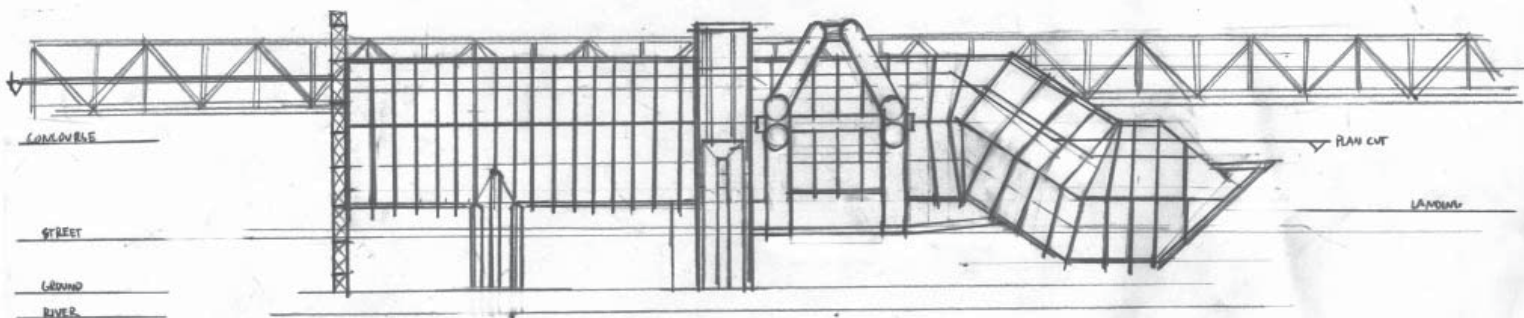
"Wuppertal Monorail South Elevation"; Steve Martz
